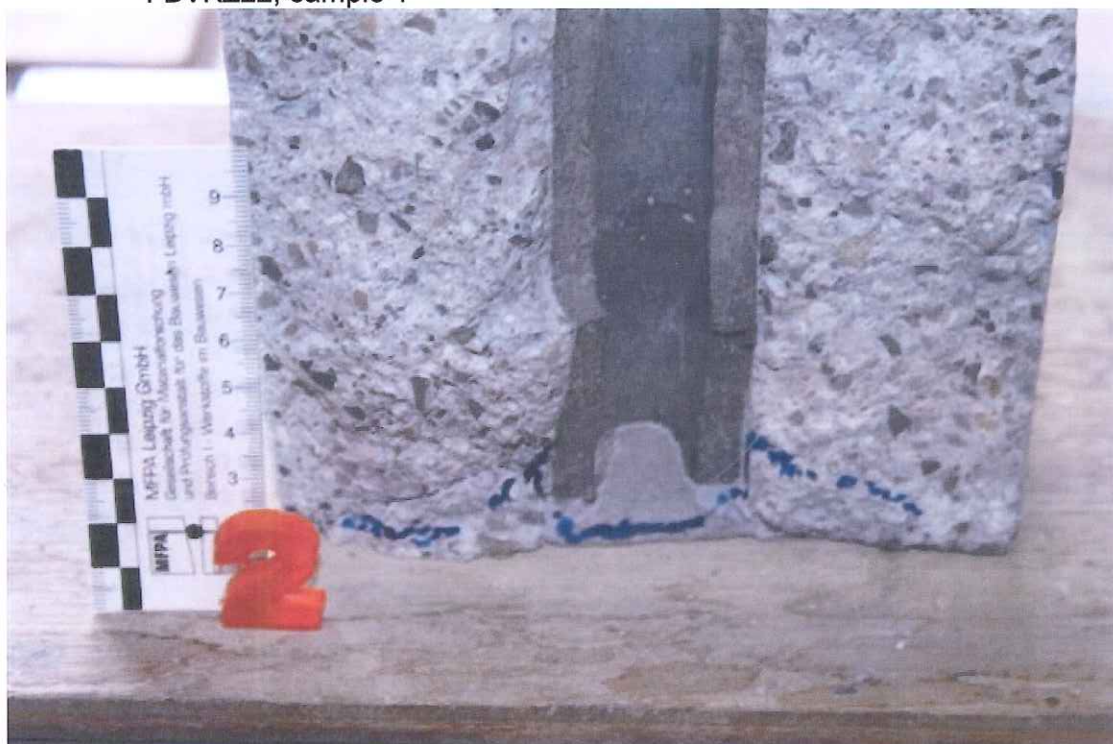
Series B 'FRANK fibre-reinforced concrete distance tubes – MR 22 with one fibre-reinforced concrete plug and one fibre-reinforced concrete sealing cone FBVKZ22, sample 2
